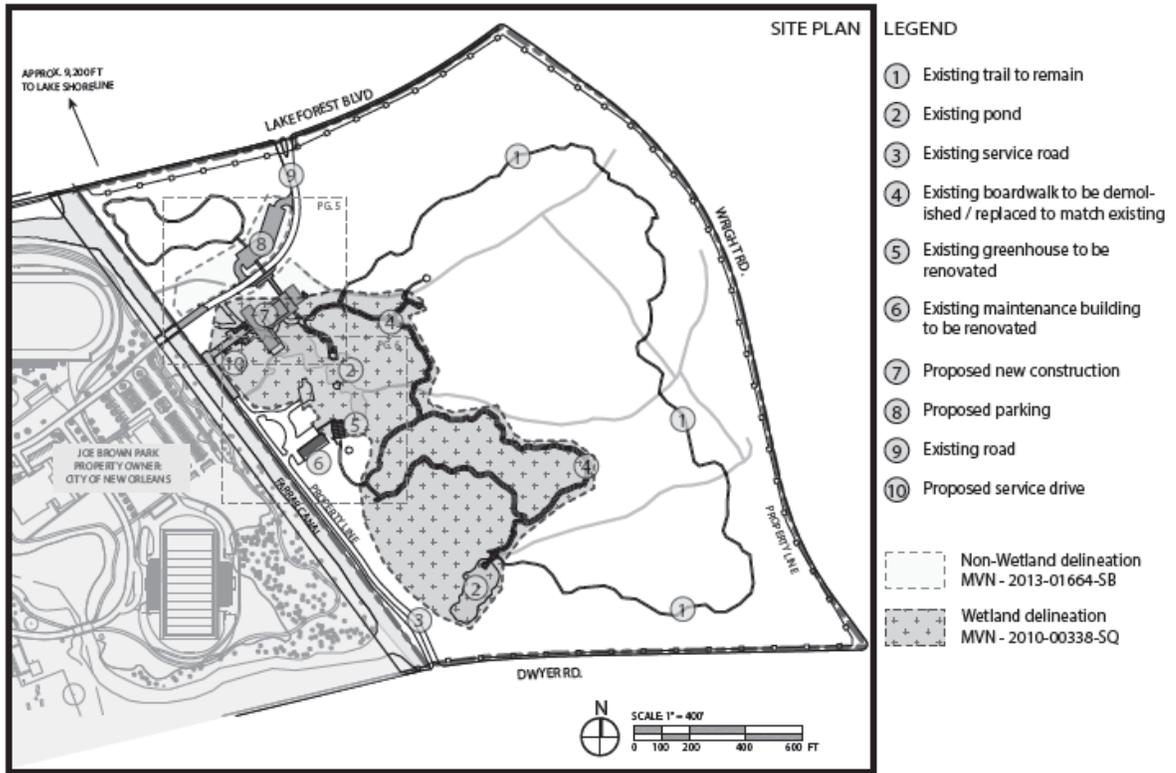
Site of ANC, showing the proposed/preferred building and parking locations and layout relative to the overall site
